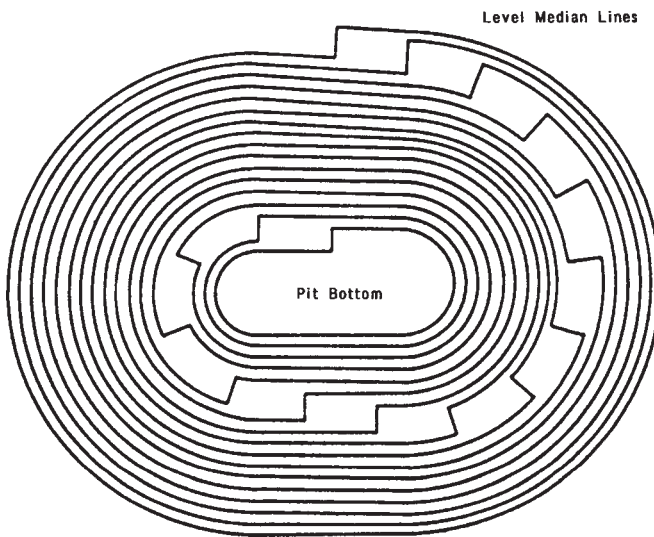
Composite ultimate pit plan (Koskiniemi, 1979).
